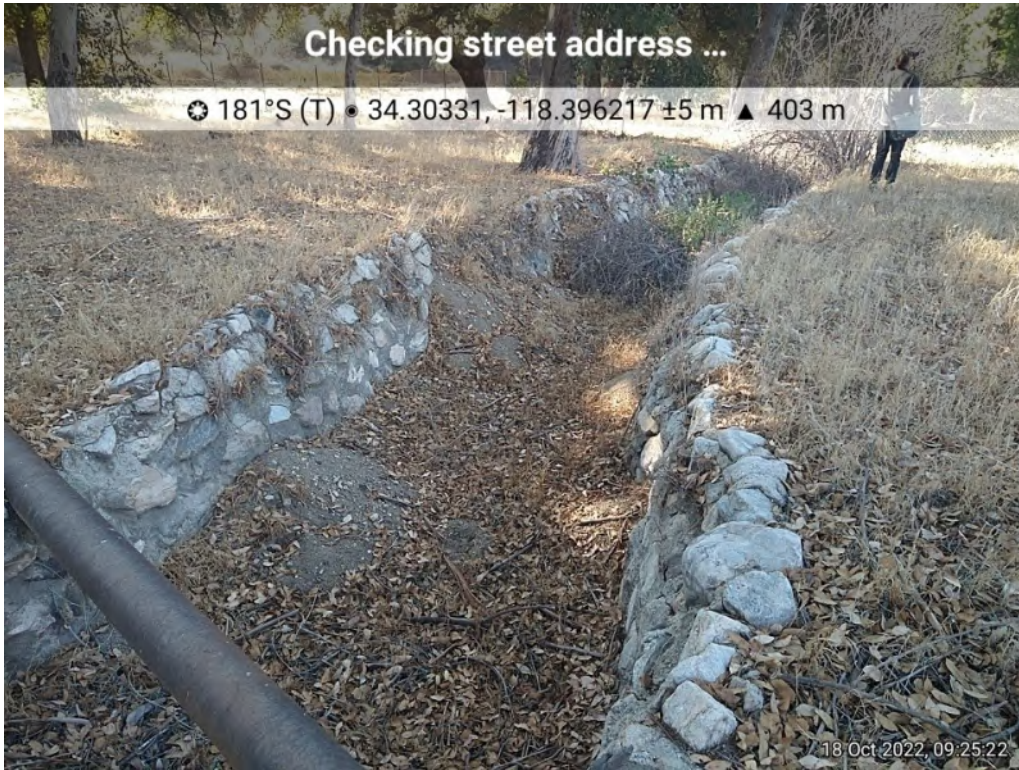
View of unnamed ephemeral channel #2 from its west TOB bounds where it becomes culverted with masonry and concrete, facing south.
